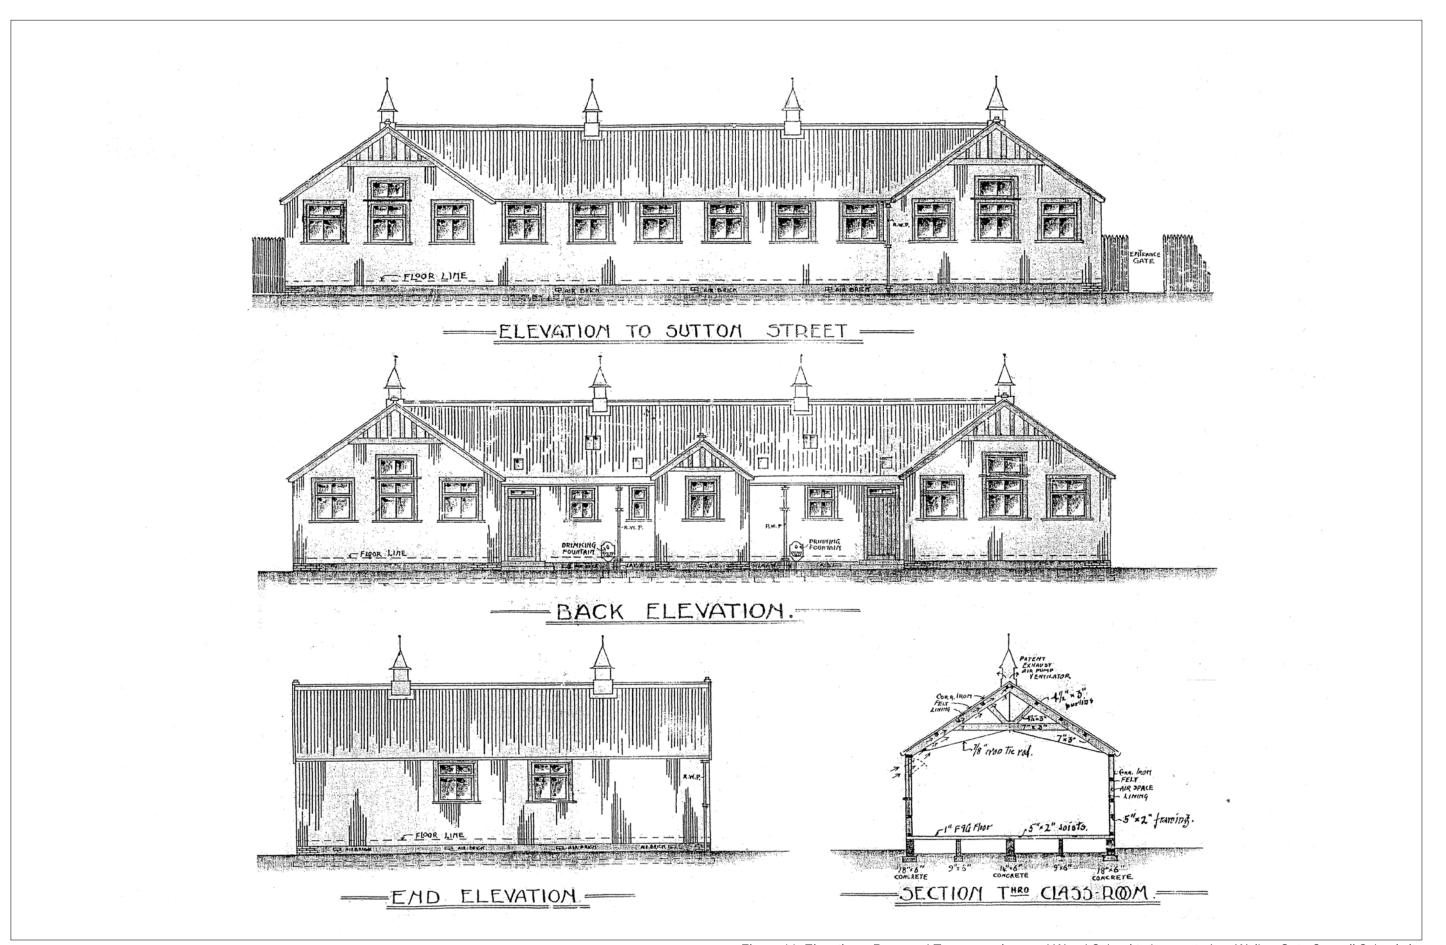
Elevations. Proposed Temporary Iron and Wood School to be erected on Walker Gate Council School site October 1908, Newcastle-upon-Tyne Education Committee
